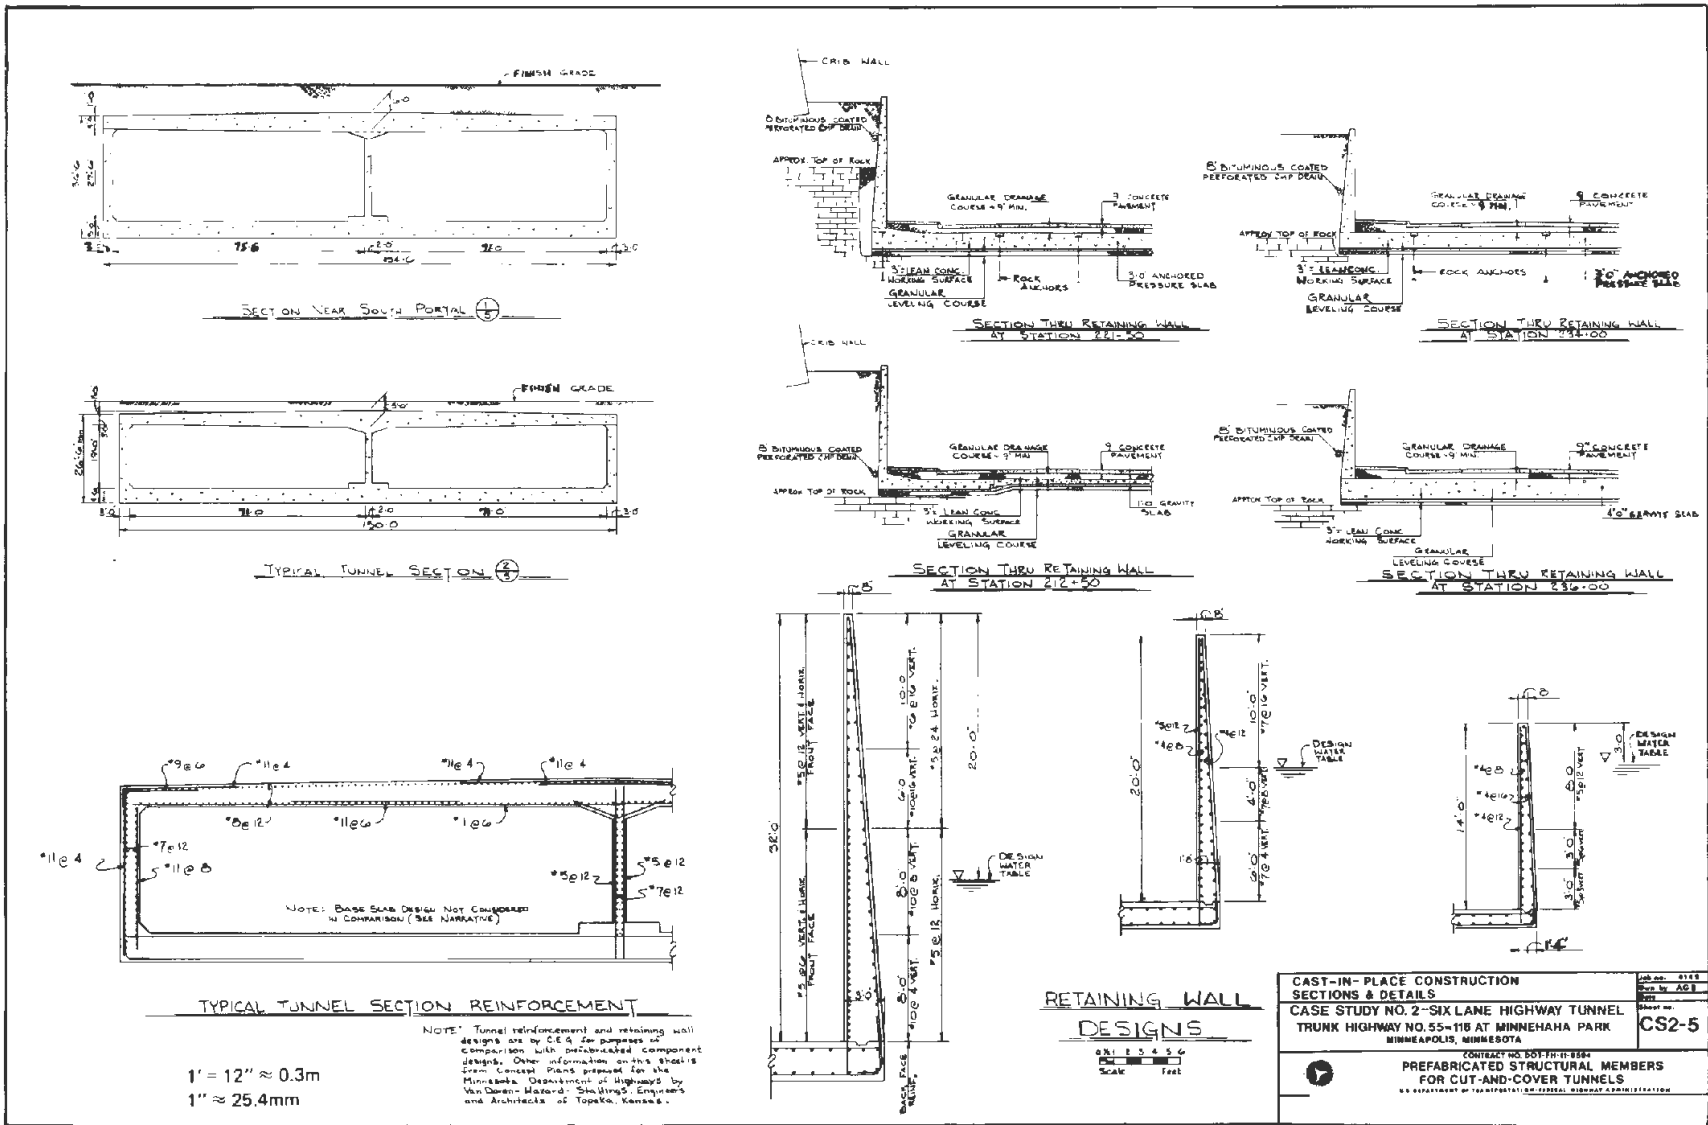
Case Study 2: Cast-in-place construction - Sections & details
